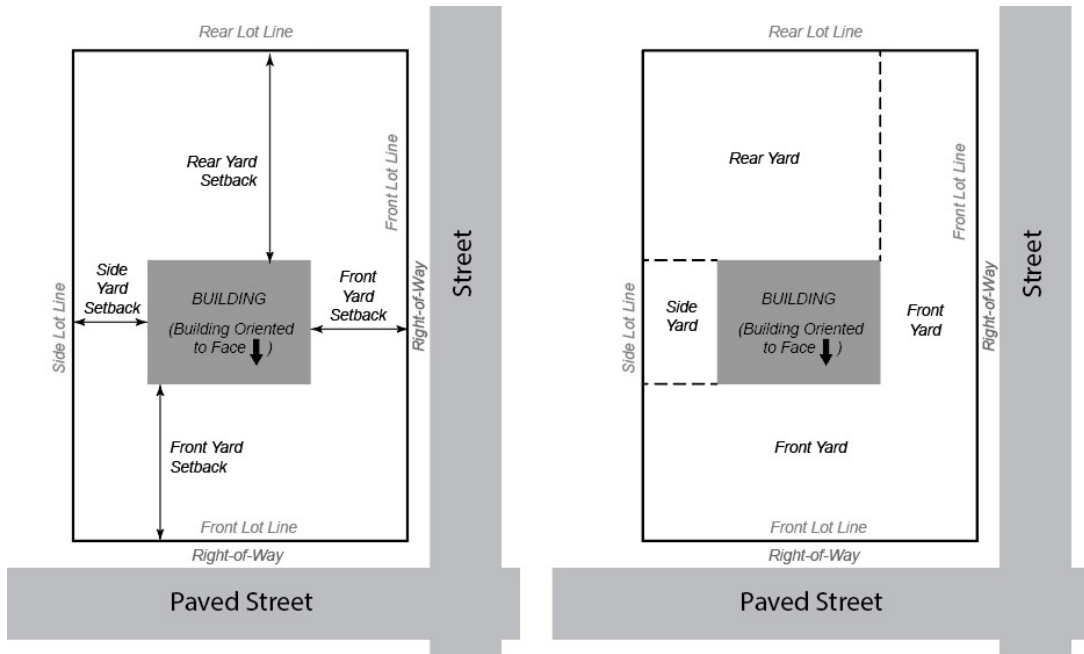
Typical lot lines and setback locations for a corner lot with the building oriented toward the narrow street frontage (left image) and typical yard locations (right image).
